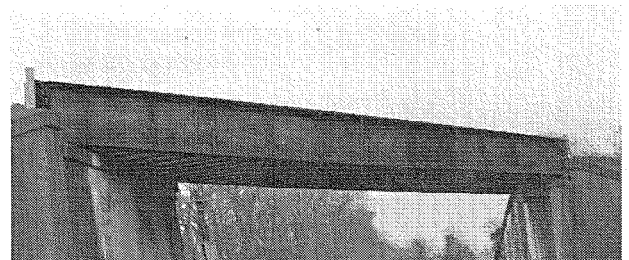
TYPICAL PLATE-GIRDER BRIDGE
